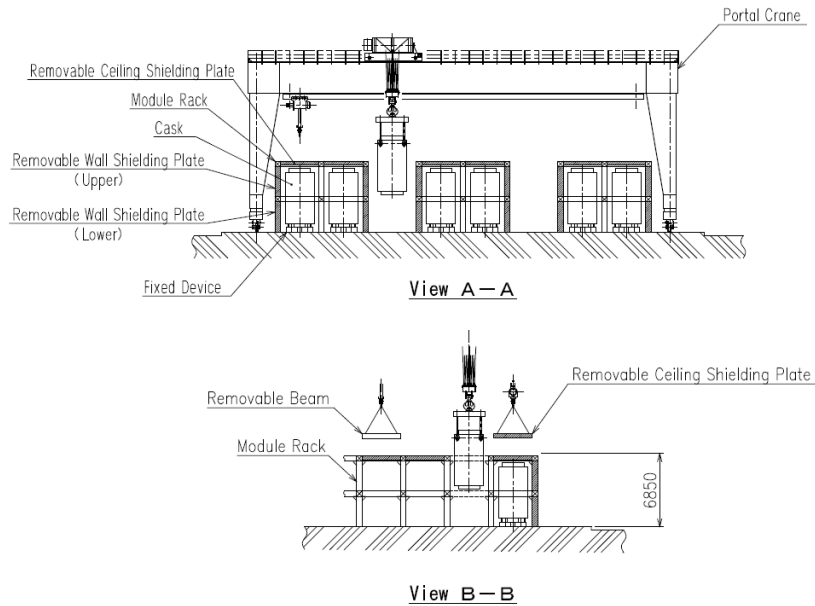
Example of interim storage facility for dual purpose cask (Section plan)
